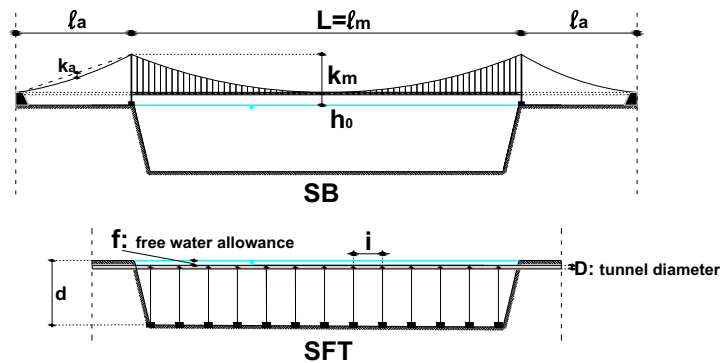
Geometrical configuration of the considered suspension bridge and submerged floating tunnel
